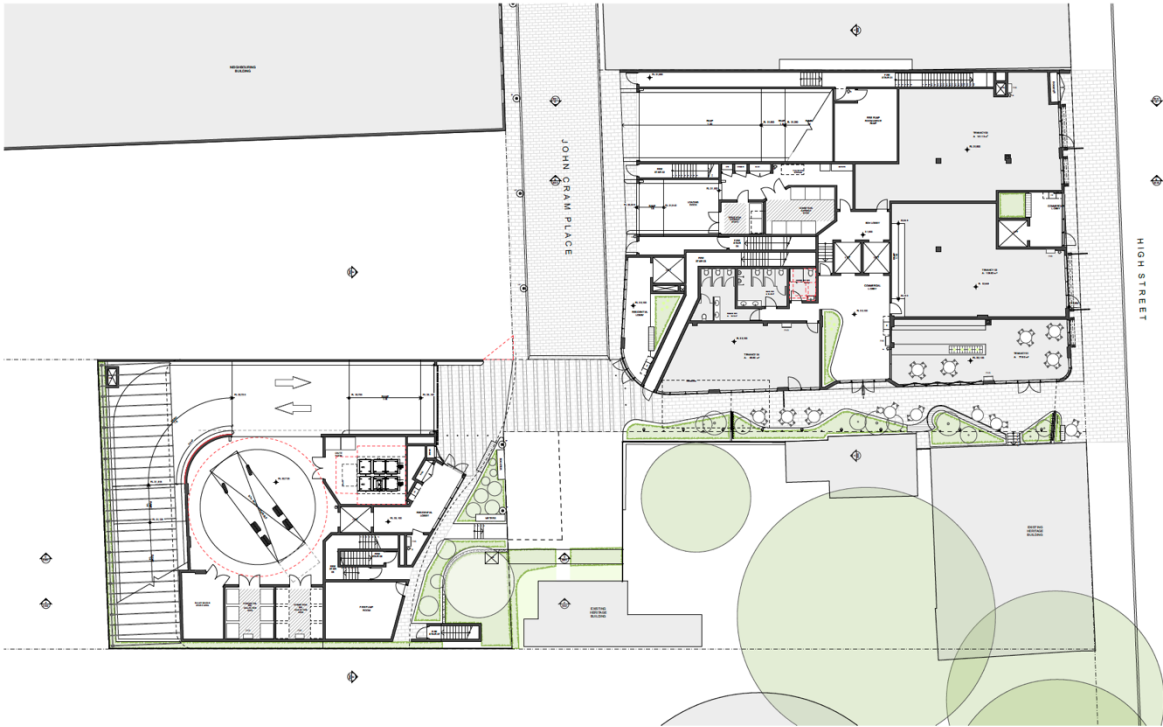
Proposed ground floor plan of the subject site, showing both Buildings A and B. Source: DA-1100, 'Ground Level Plan,' Issue Q.
